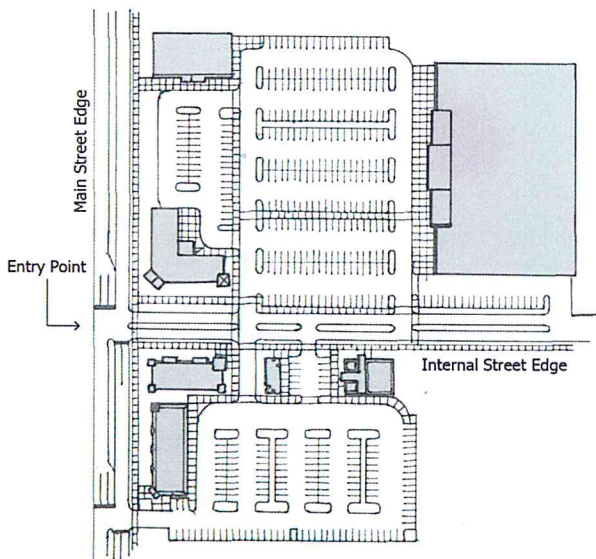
(Pad Sites): Sites with multiple buildings should reduce the number of entry points and orient outparcel to both the main and internal street edges, as shown above. Pedestrian accommodations (shown as connected tiles) should also be provided throughout the site connecting all structures and parking areas.
